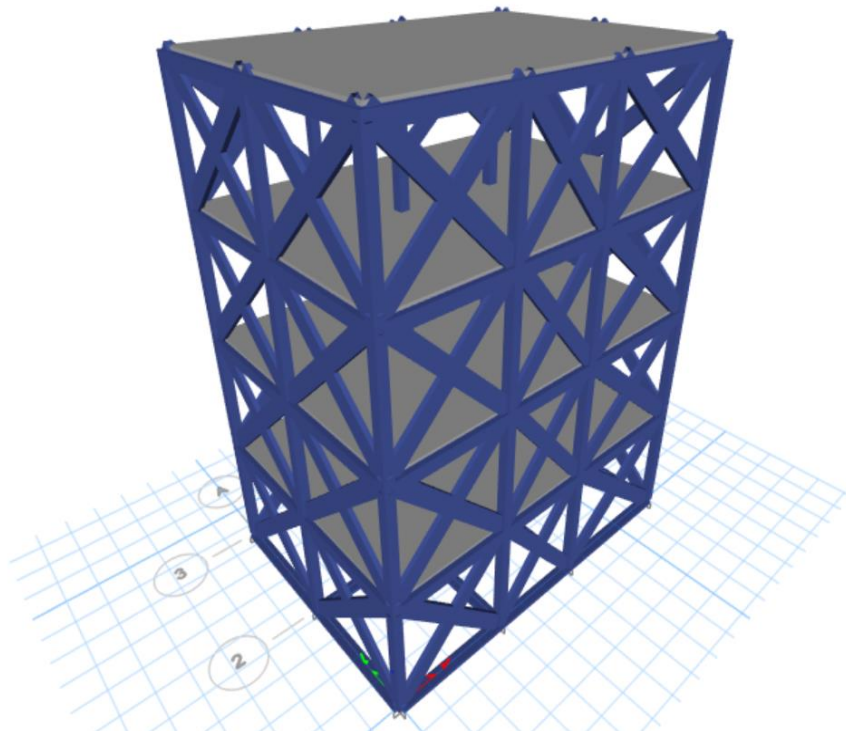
Rendering view of CMS with wall modeled as a cross diagonal strut
